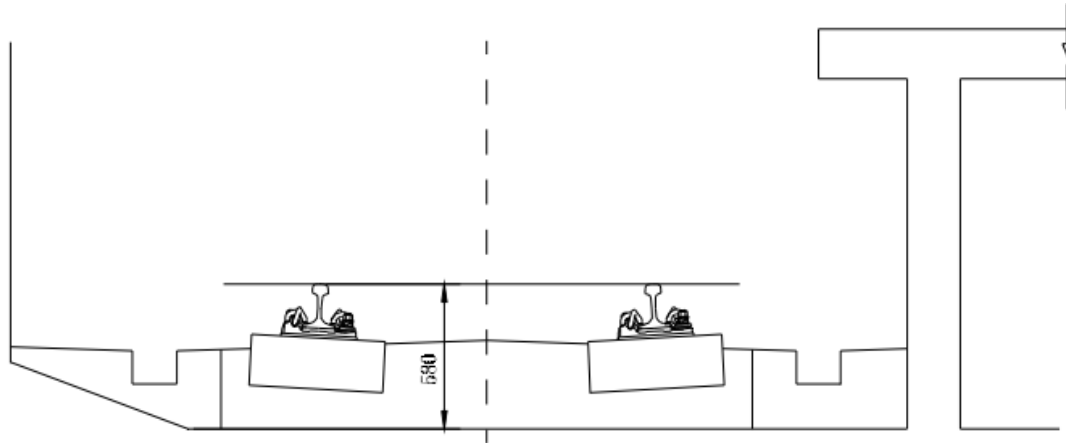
Underground Solid bed with Reinforced Concrete Short Sleeper AALRT project [42]
